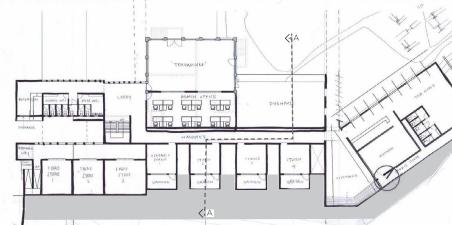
Iteration 8 Ground Floor Plan August (Author 2017)
